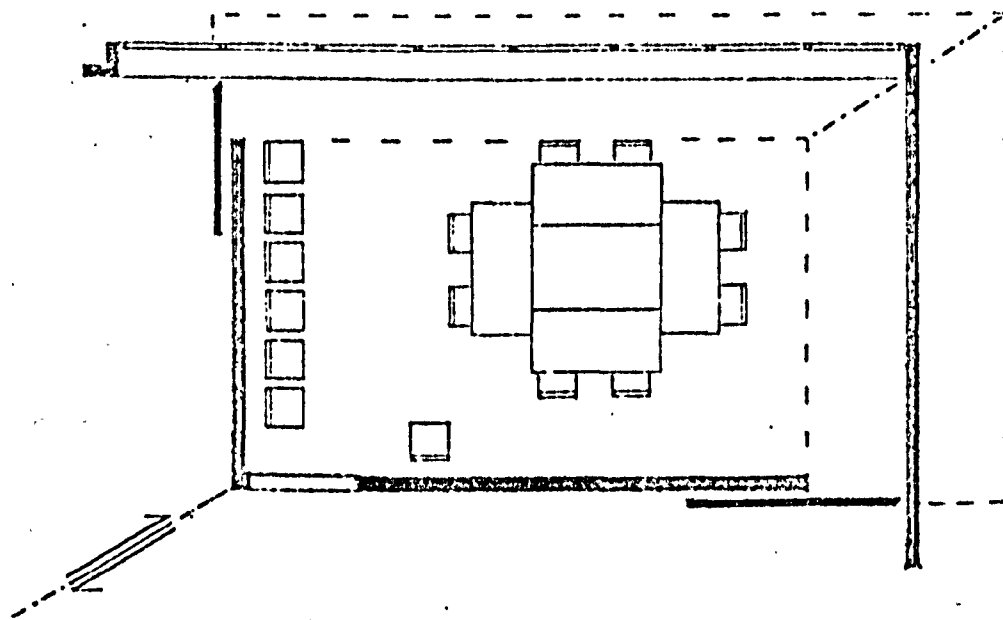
1/10 plan of adjustable model in condition VIII; continuous window, root three proportion, window on long wall.
